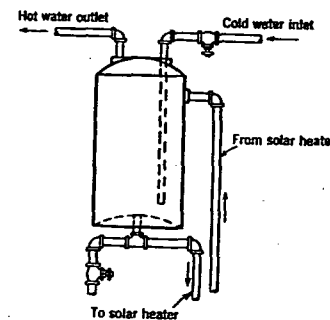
SOLAR HEATER TANK CONNECTIONS
